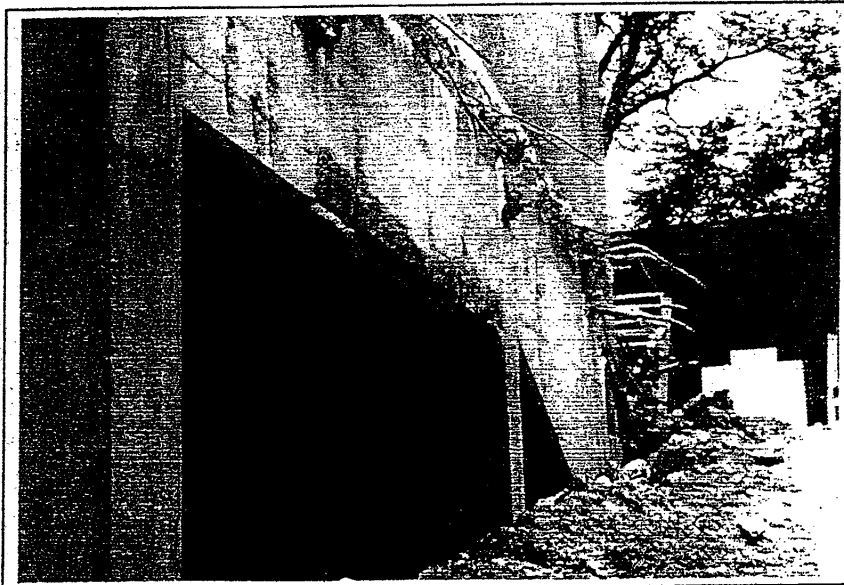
Example of severe rebar corrosion exposed during demolition. This particular member has to be repaired at any cost to retain integrity of original southwest planter above.
